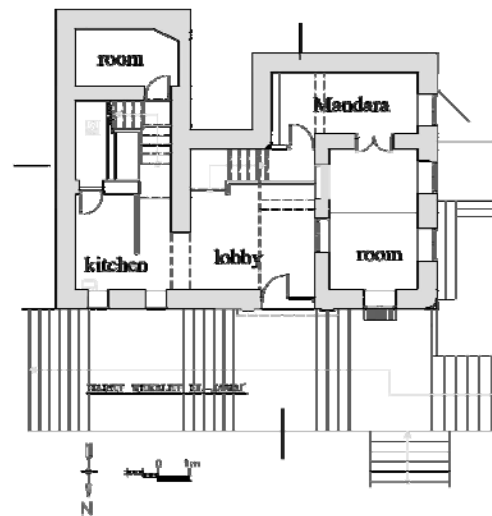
Bayt Al-Sitt 'Awaṭif: Ground floor plan
